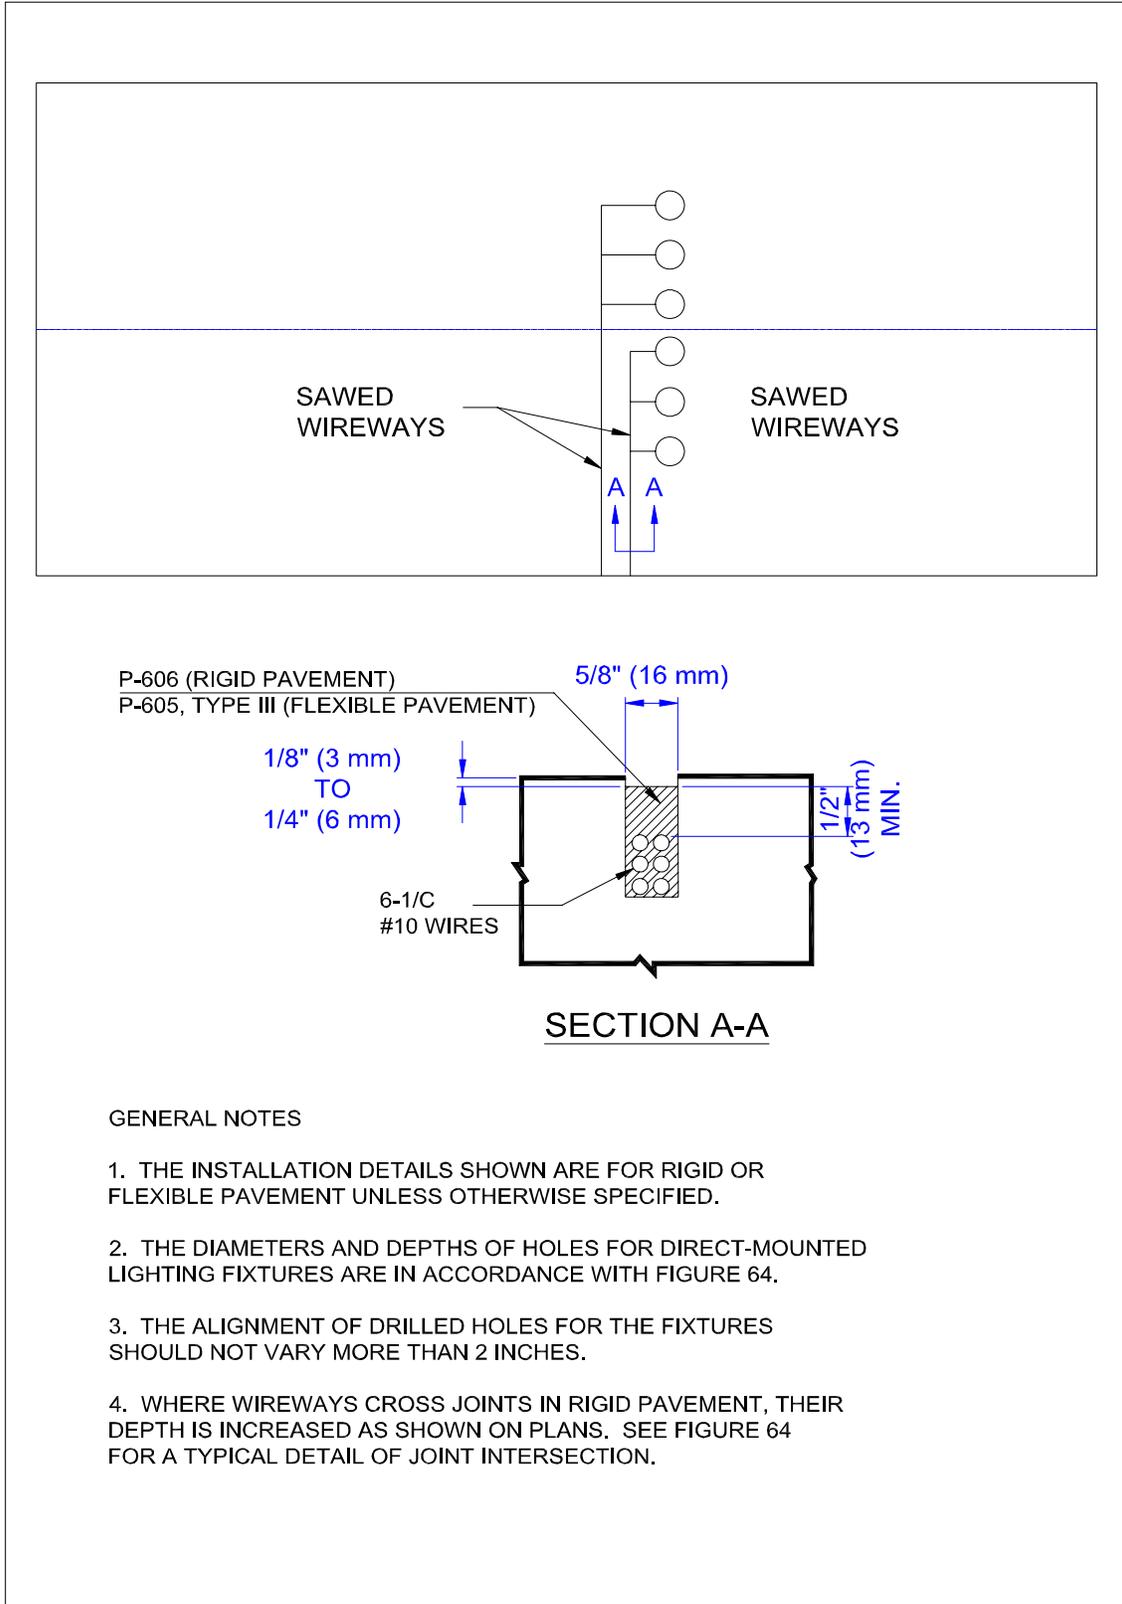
Typical Wireway Installation Details for Land & Hold Short Lights.
